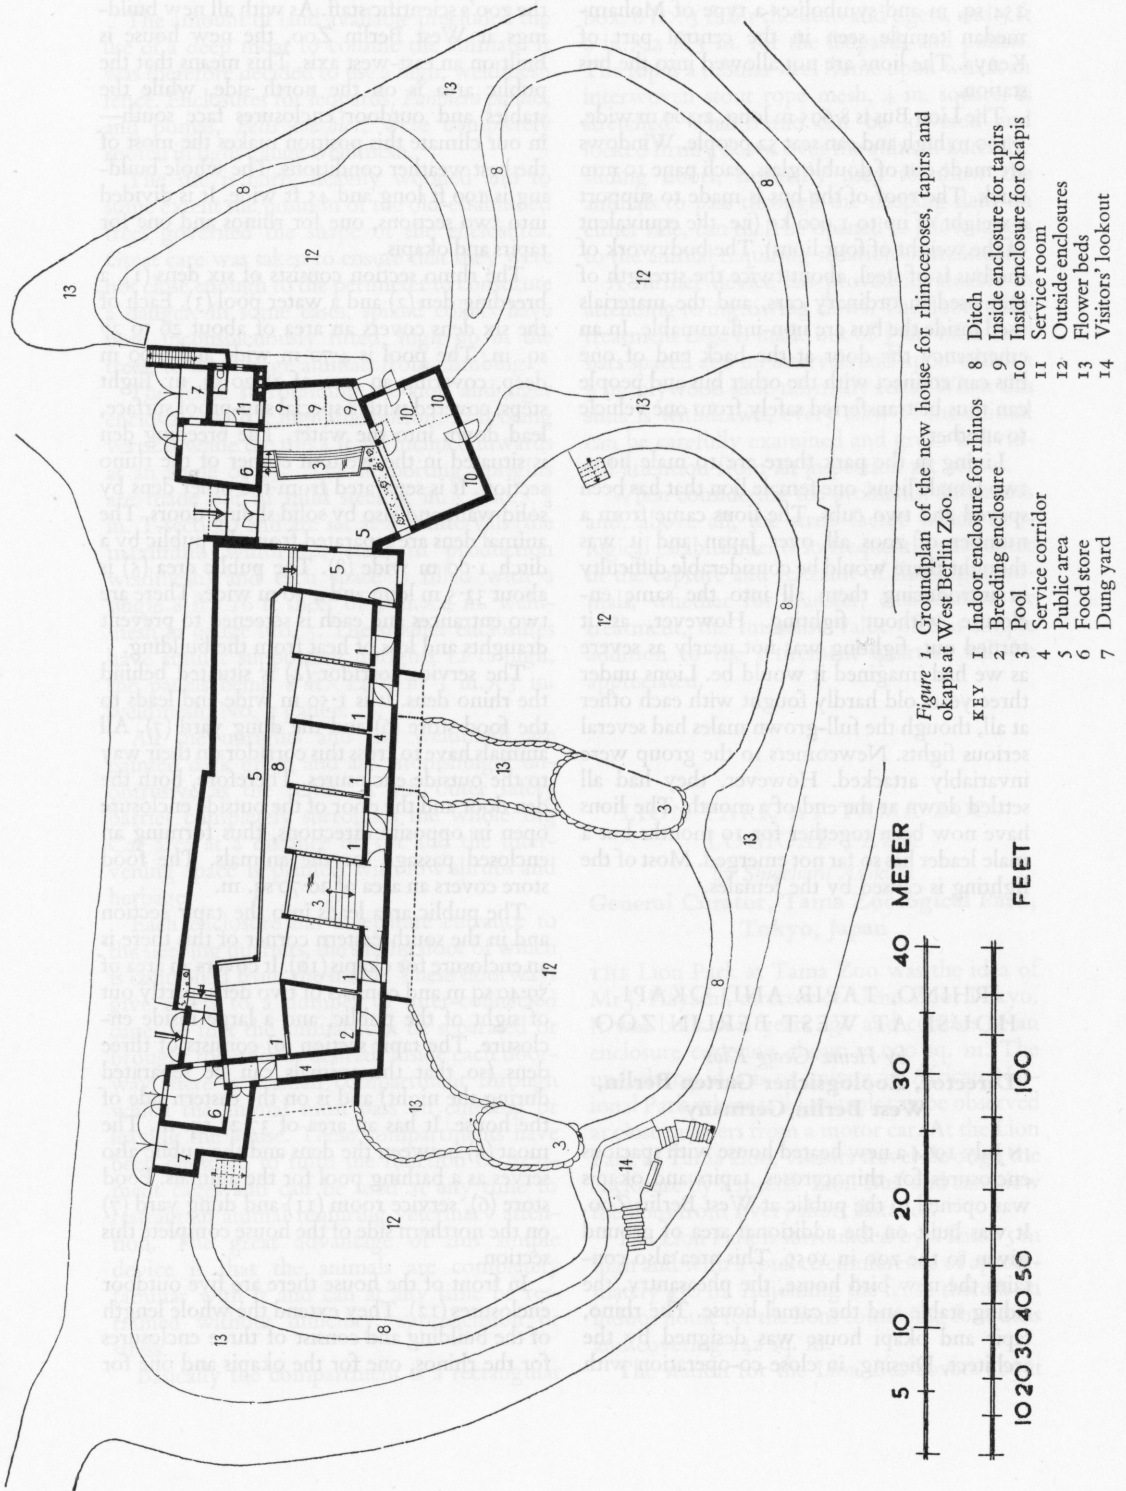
Ground plan of the new house for rhinoceroses, tapirs and okapis at West Berlin Zoo.
